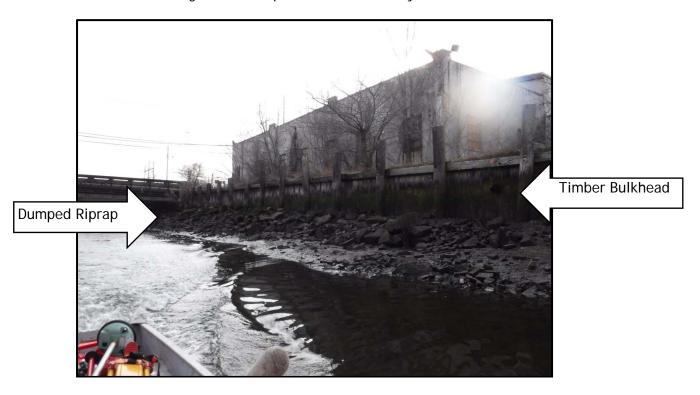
Timber bulkhead with riprap at toe along former St. Gobain, looking southwest, photo taken February 19, 2016.
